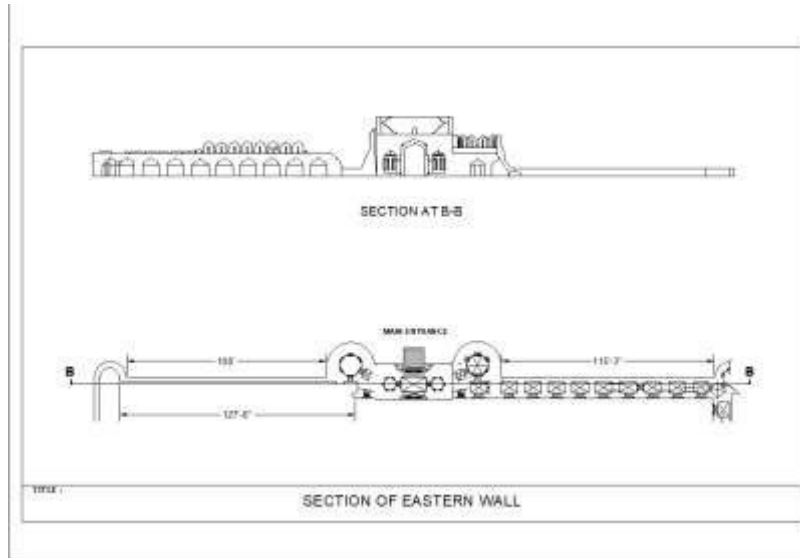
Plan of Section of Eastern Wall (Section B-B) of Rewat Fort (after Saeed 2020, p.50)
